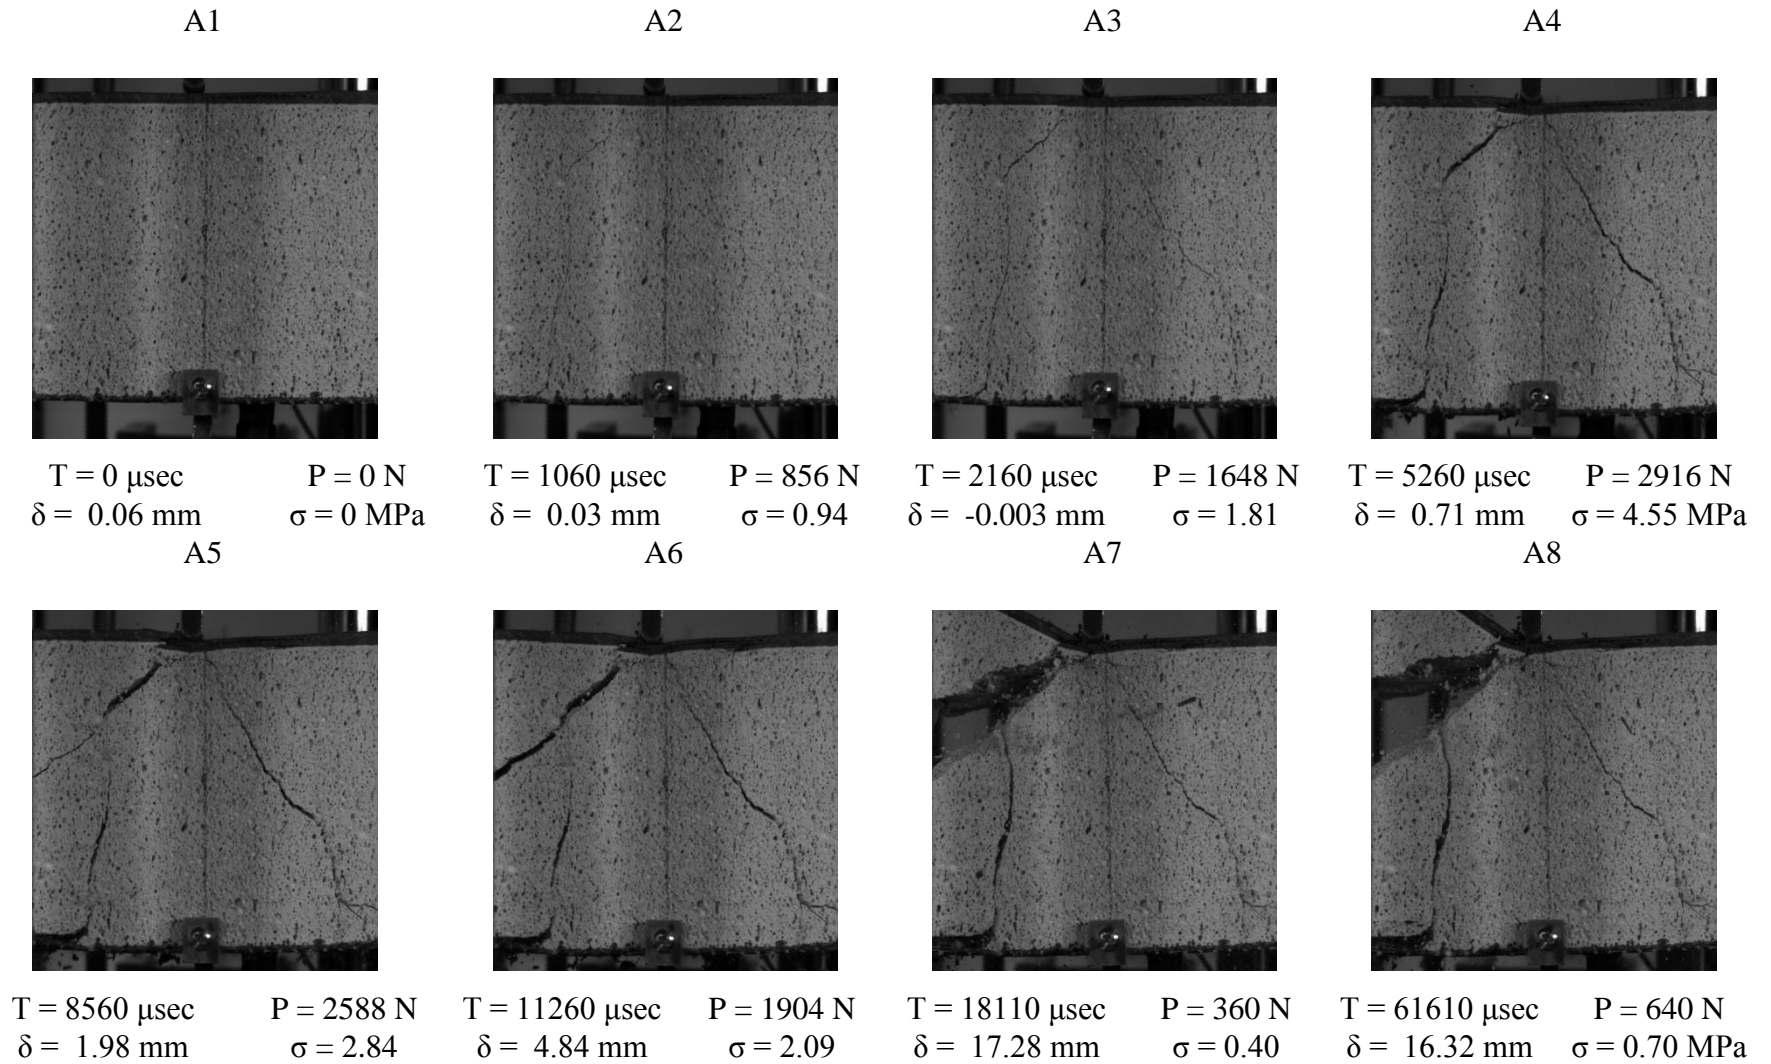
(b) : Crack propagation of SWAAC-B beam under impact loading (Drop Height = 300 mm)
